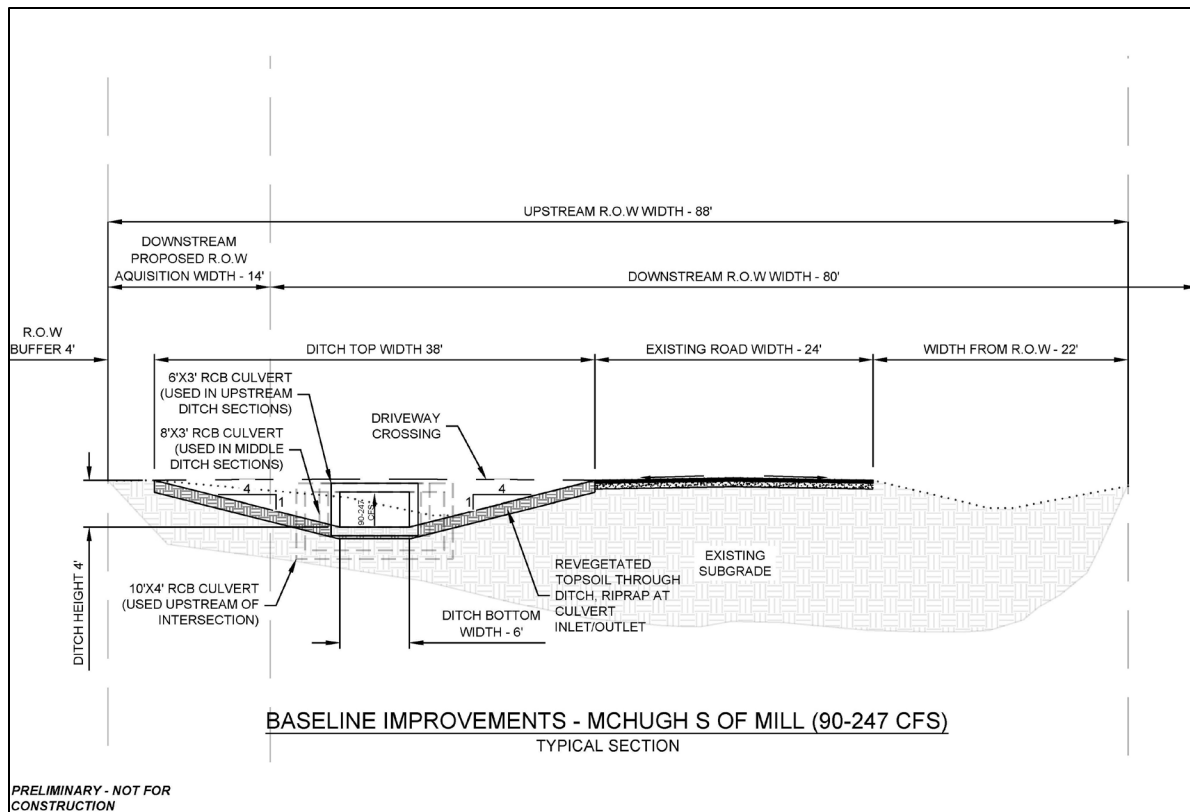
Typical section for the roadside ditch and RCB culvert layout along McHugh Lane south of Mill Road.
